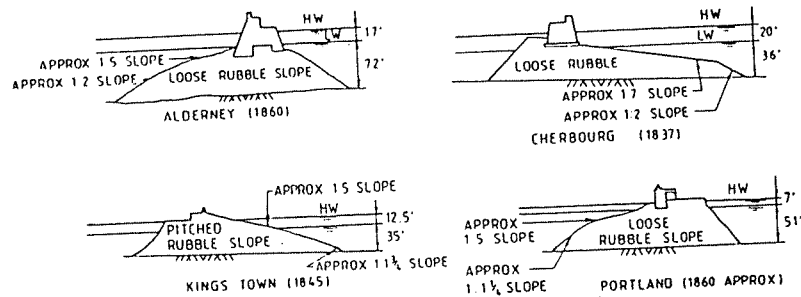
Examples of historical berm breakwaters (Figure from Hall (1987)).
